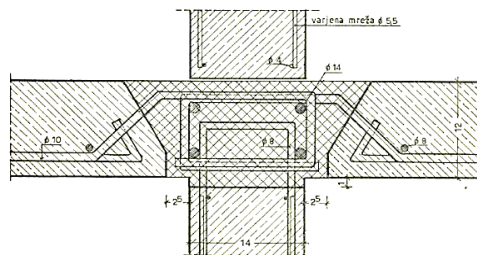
Horizontal joints – vertical section through a wall-to-floor panel joint, showing cast in-situ RC tie-beam, JU-61 [20]
